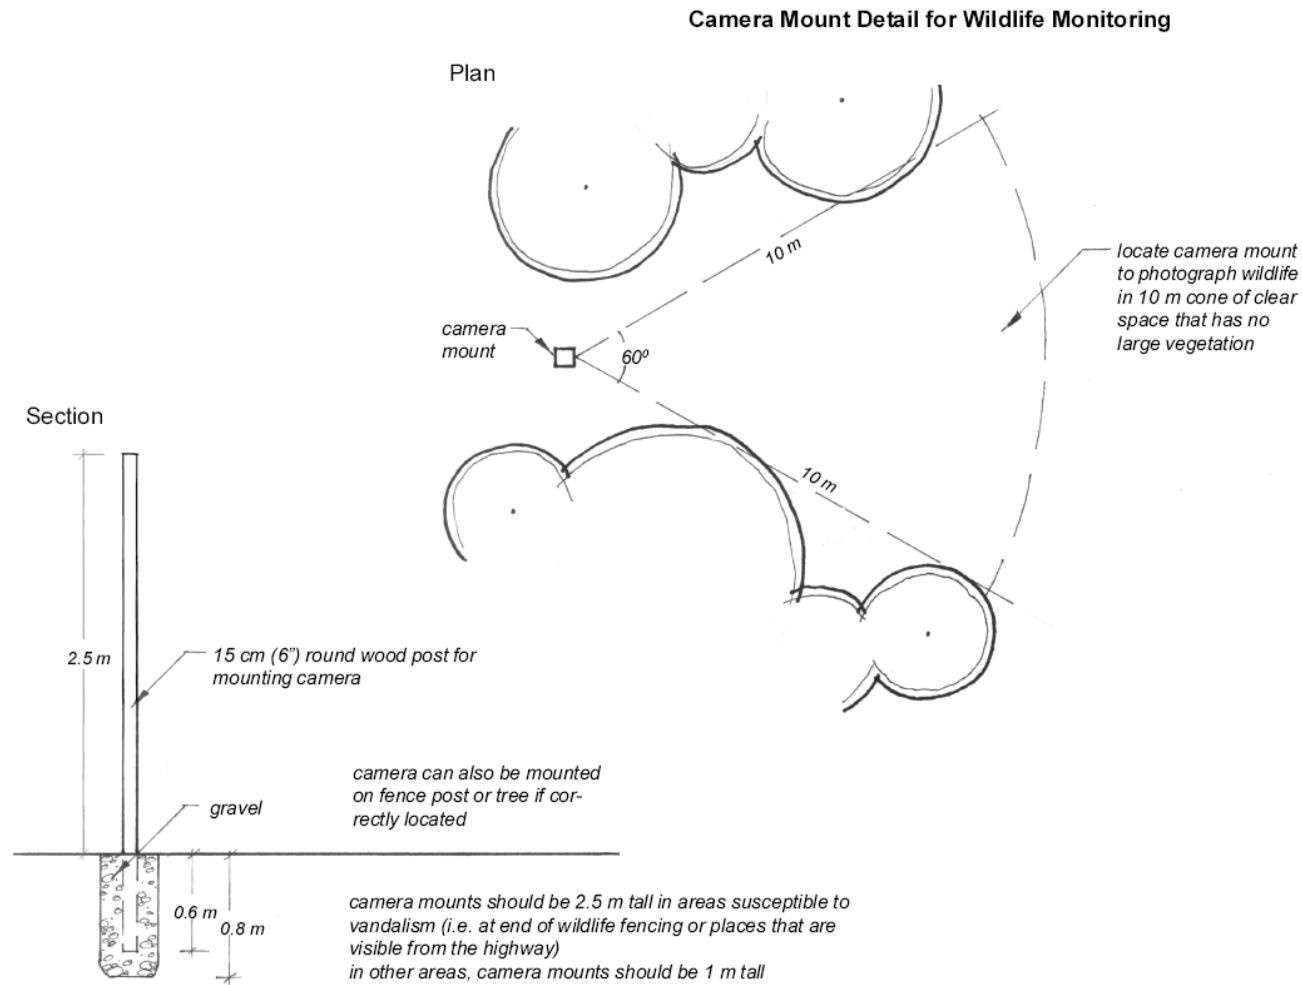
Remote-trigger camera mount typical design details provided to US 93 design consultants (Jones and Jones 2002b).
